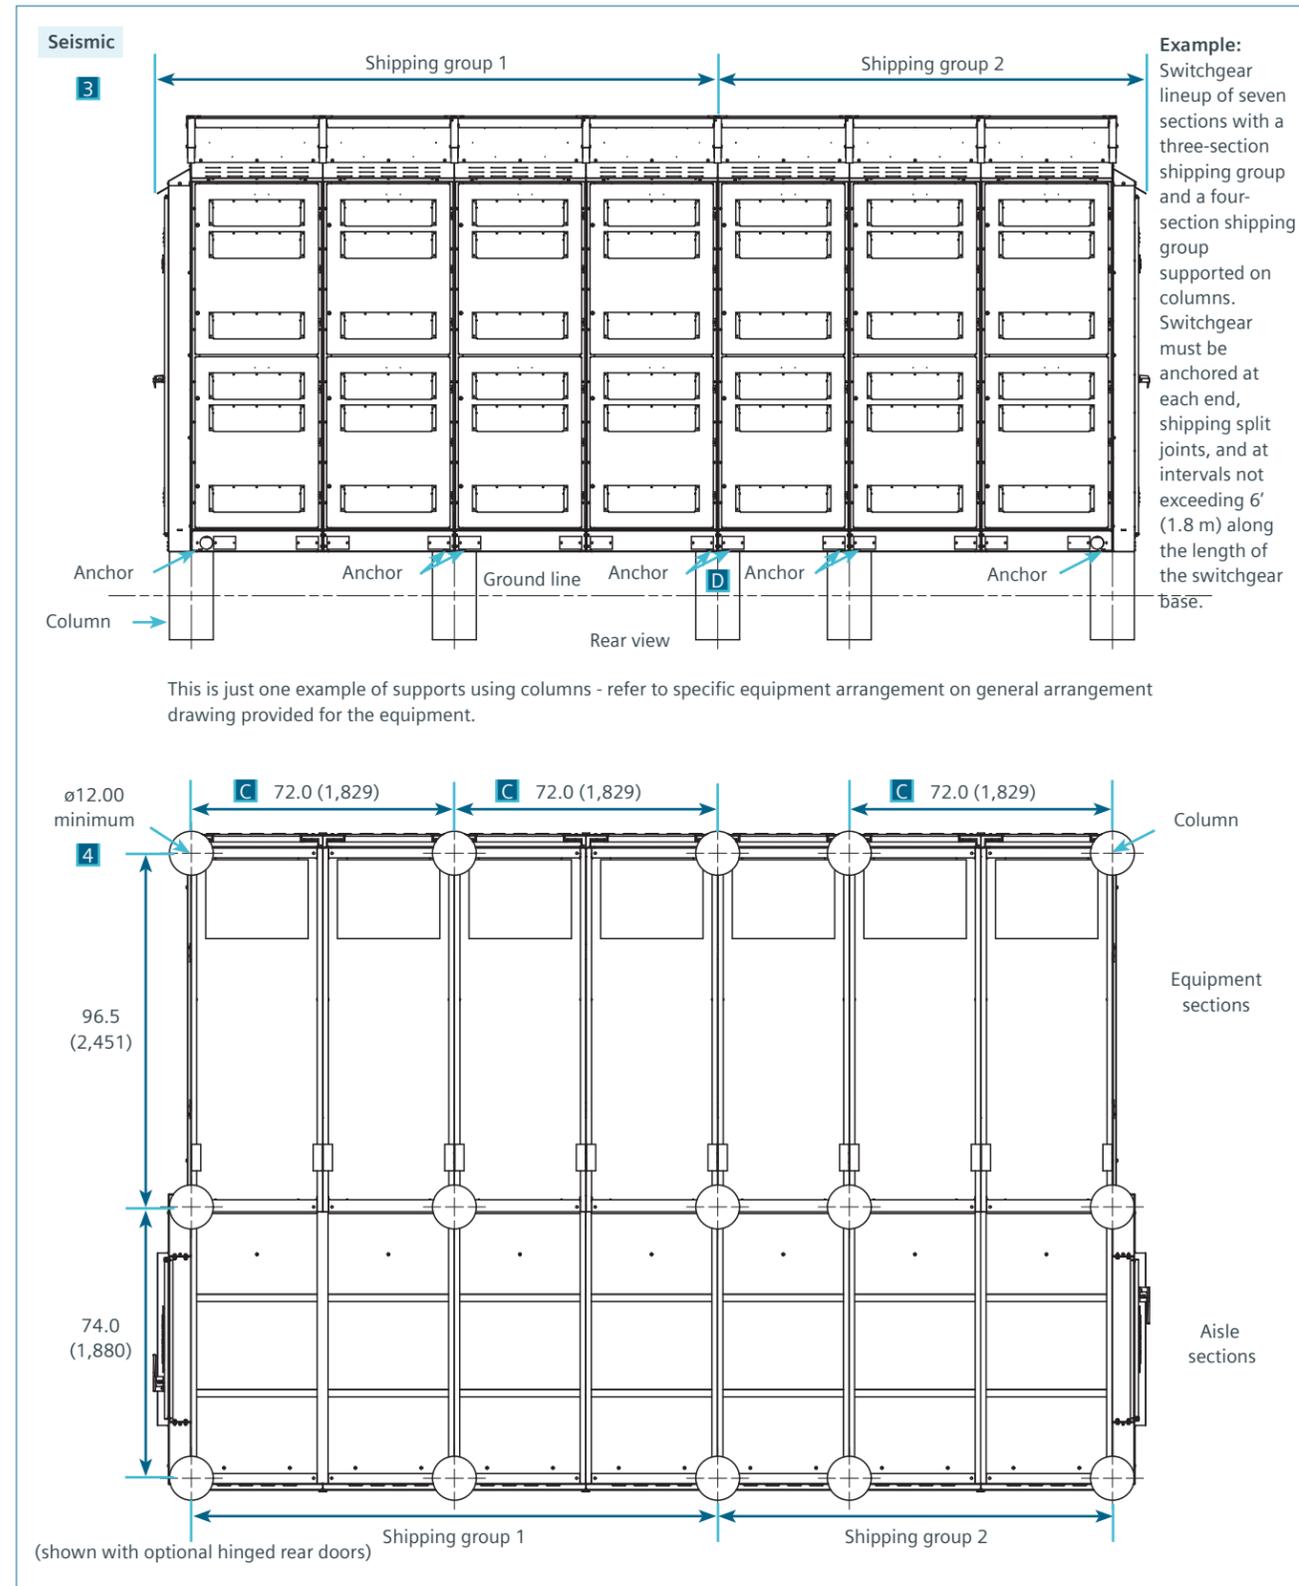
Anchoring outdoor type SGM-SG Shelter-Clad single-aisle switchgear (continued)
